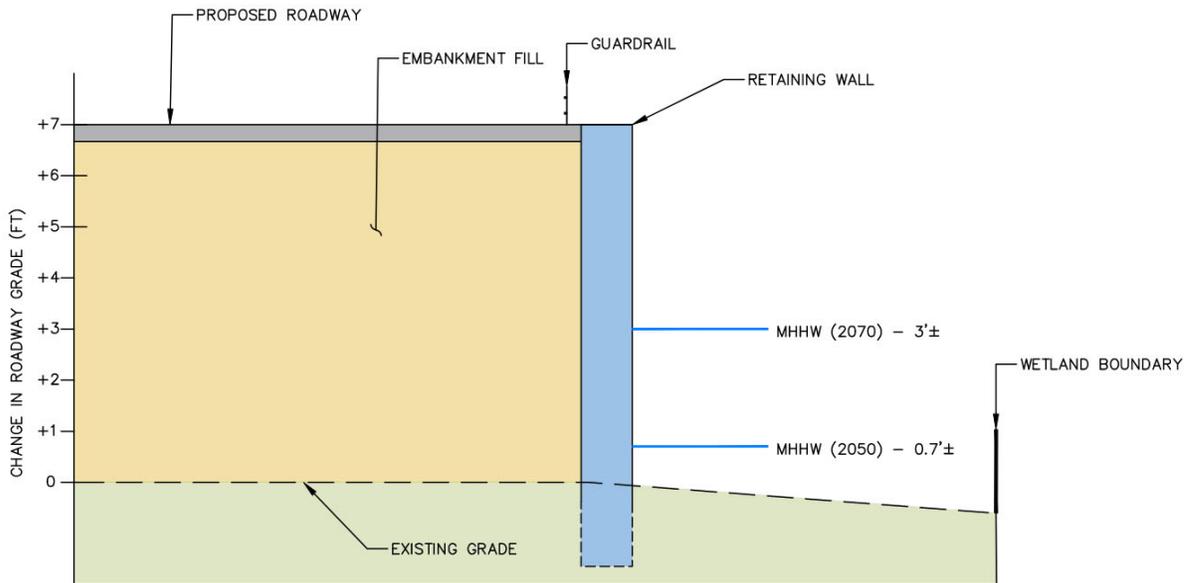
Representative cross section of Alternative 3: Raising the Road to Elevation 11.0
